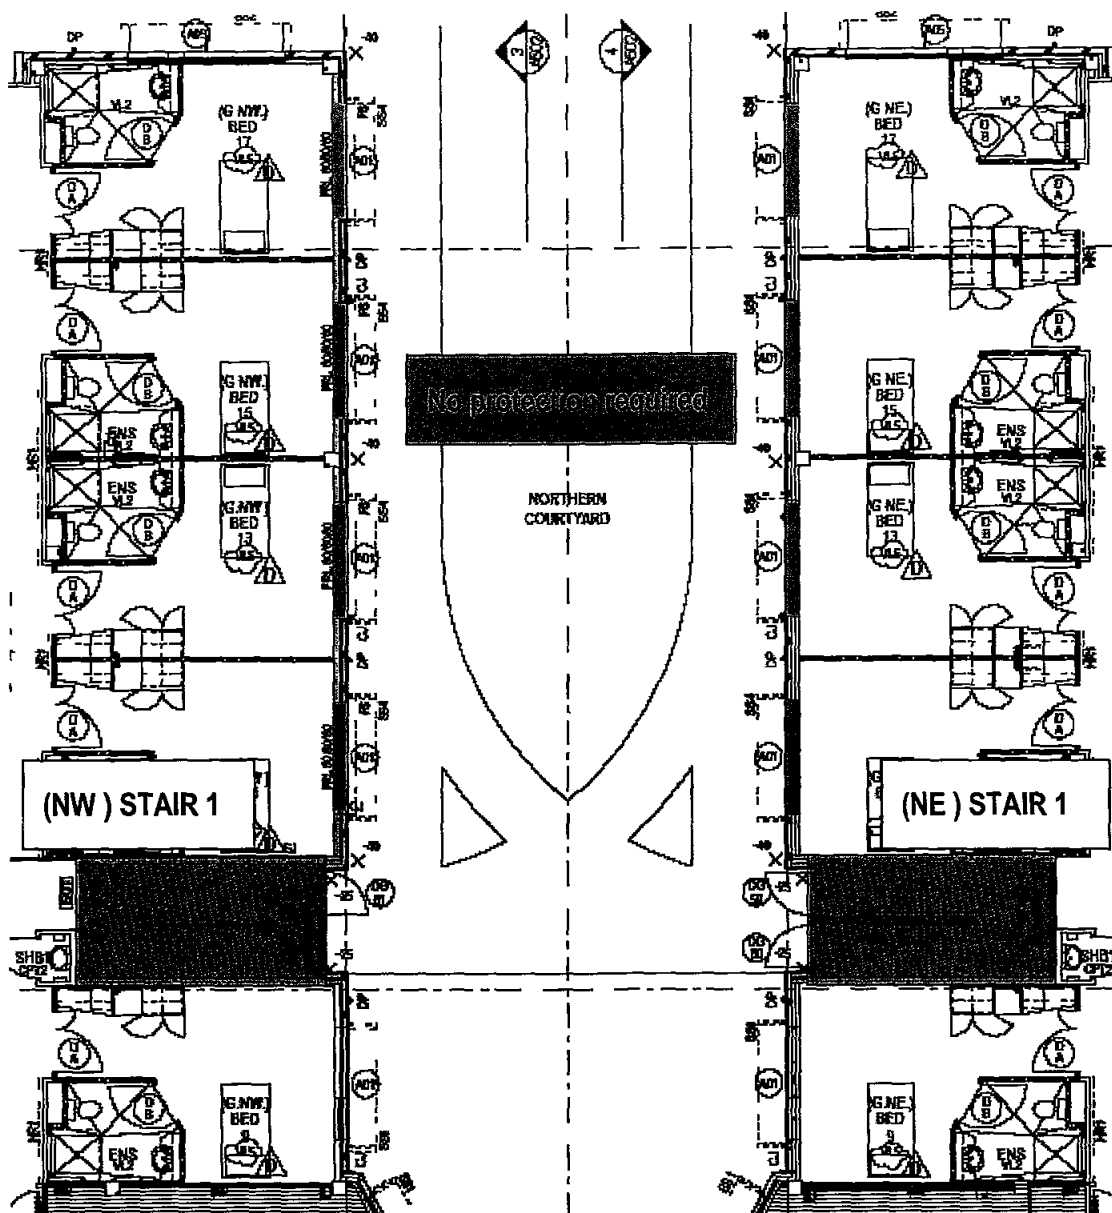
Discharge from (NW) STAIR 1 and (NE) STAIR 1
